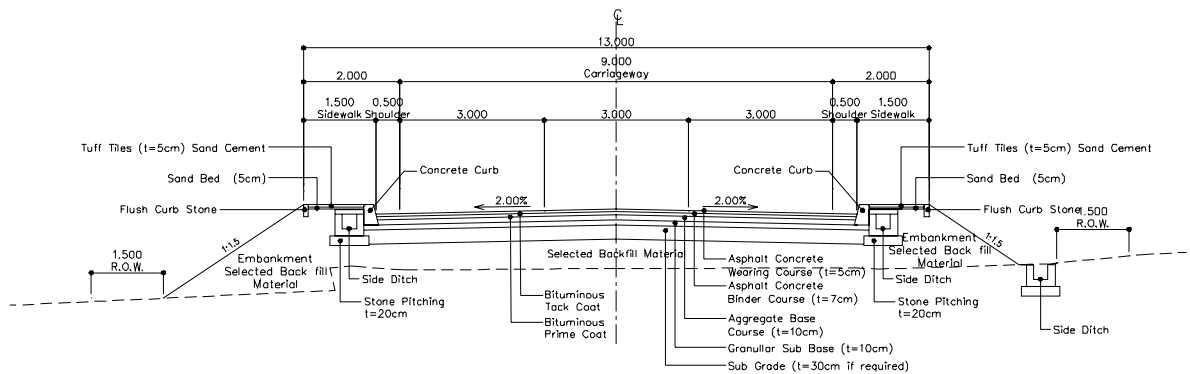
Typical Cross Section with Side Walk (Mount Up Type)
